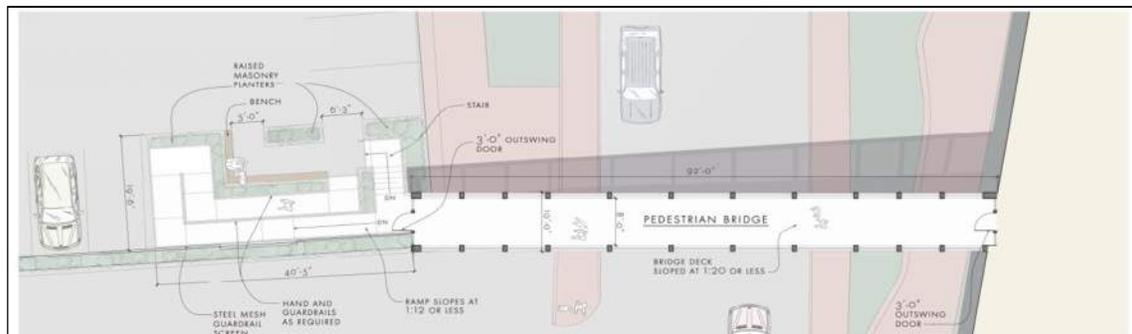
Pedestrian Sky Bridge Site Plan, Alternative 4b (DeStefano Architects, 2013)
